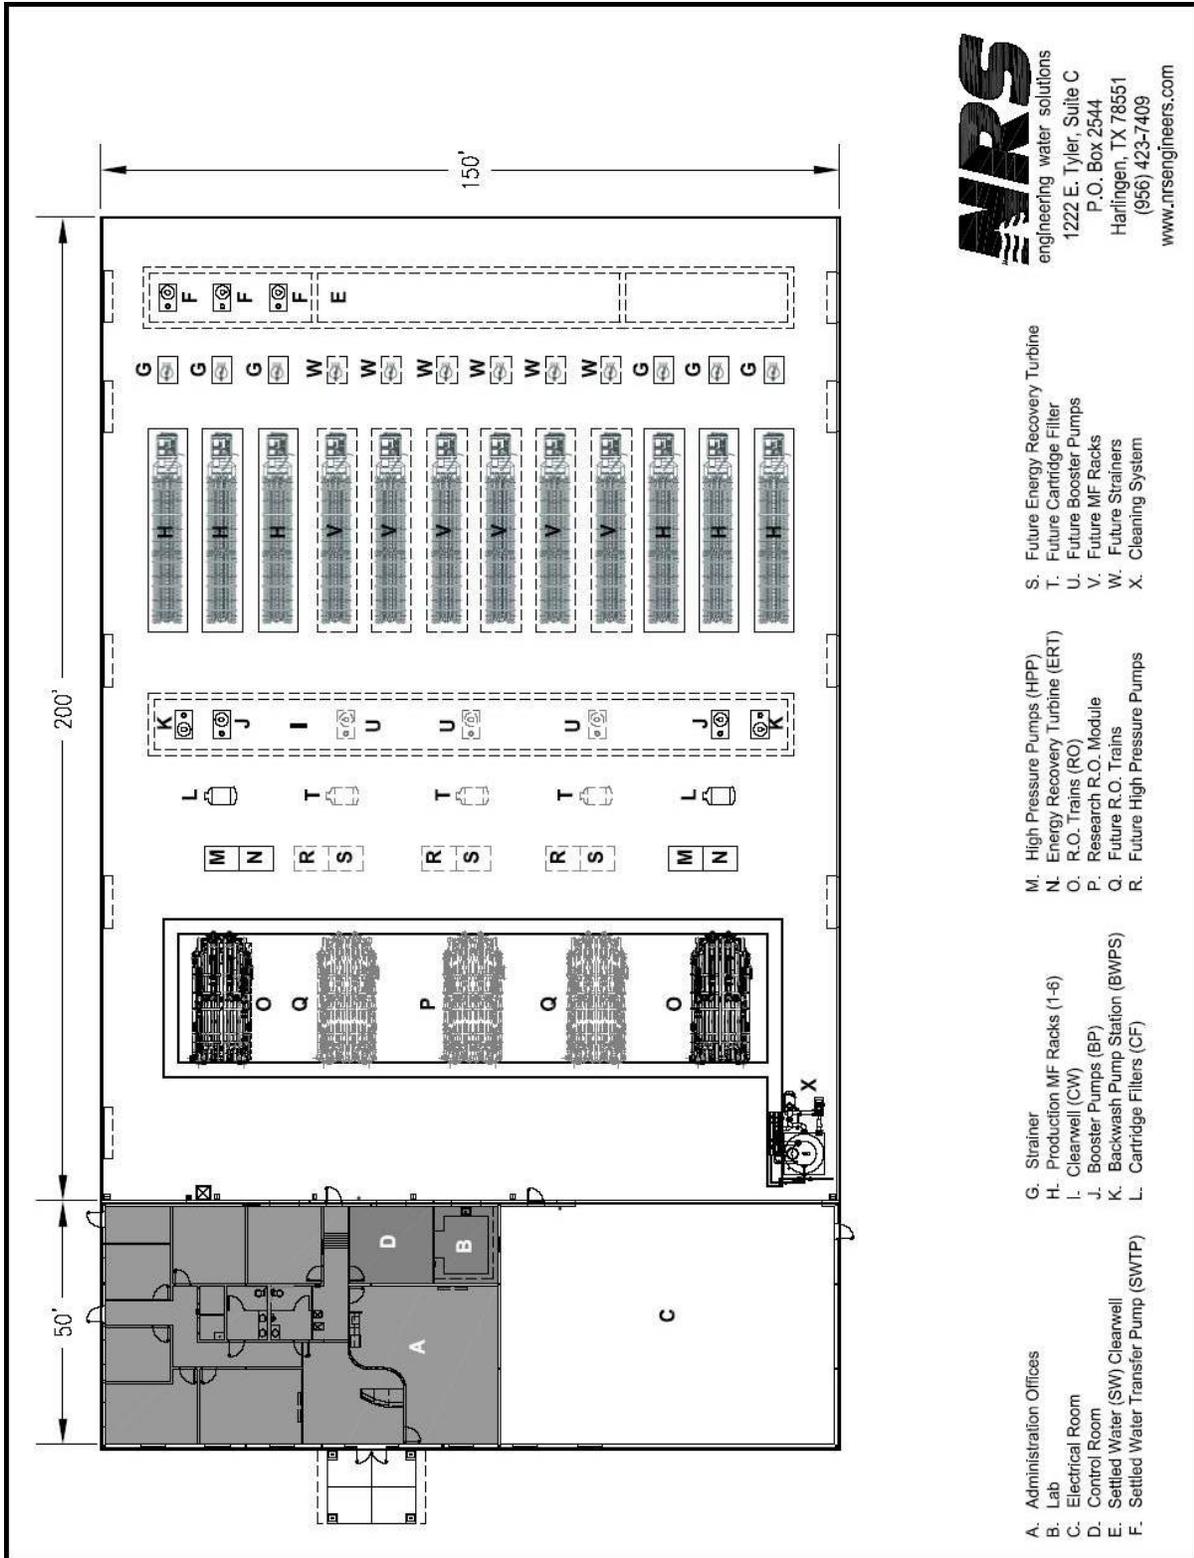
Layout of the treatment systems and building for the proposed 2.5 mgd Demonstration Project.
